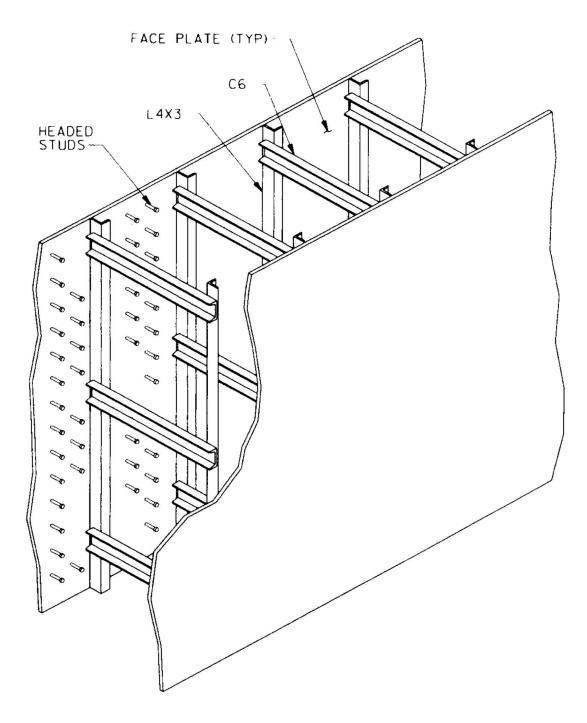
(Sheet 7 of 7) [Structural Modules in Containment Internal Structures]\
